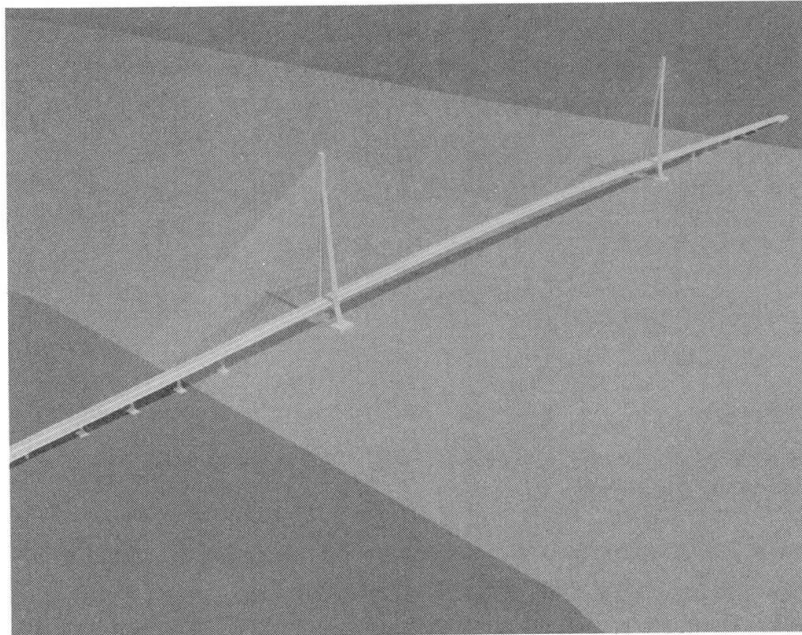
Ceremonial Bridge, Malaysia (Photo-montage)
